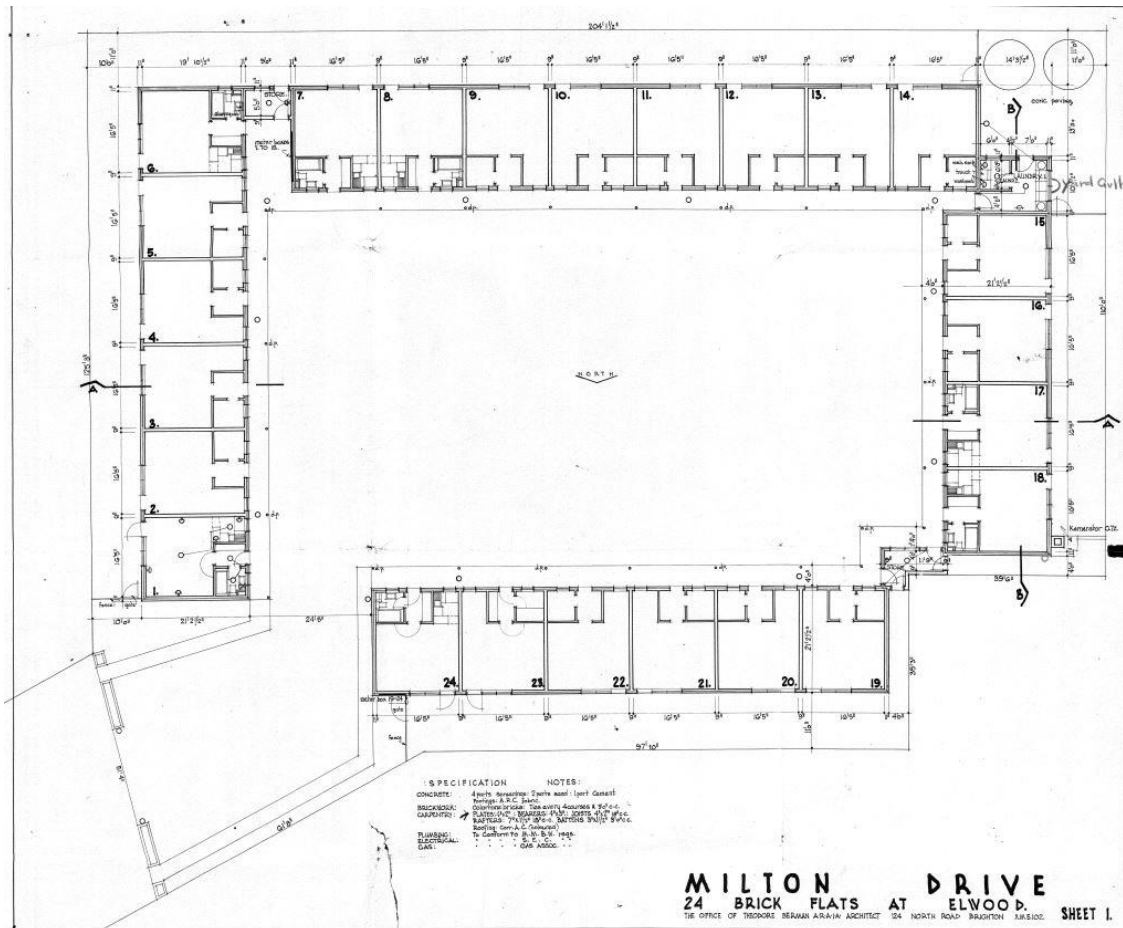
Original layout plan (Source: City of Port Phillip Building Archives)
